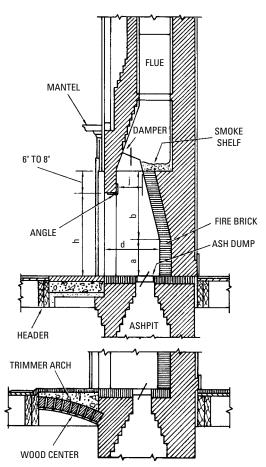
Fireplace sectional view illustrating two types of hearth construction.
